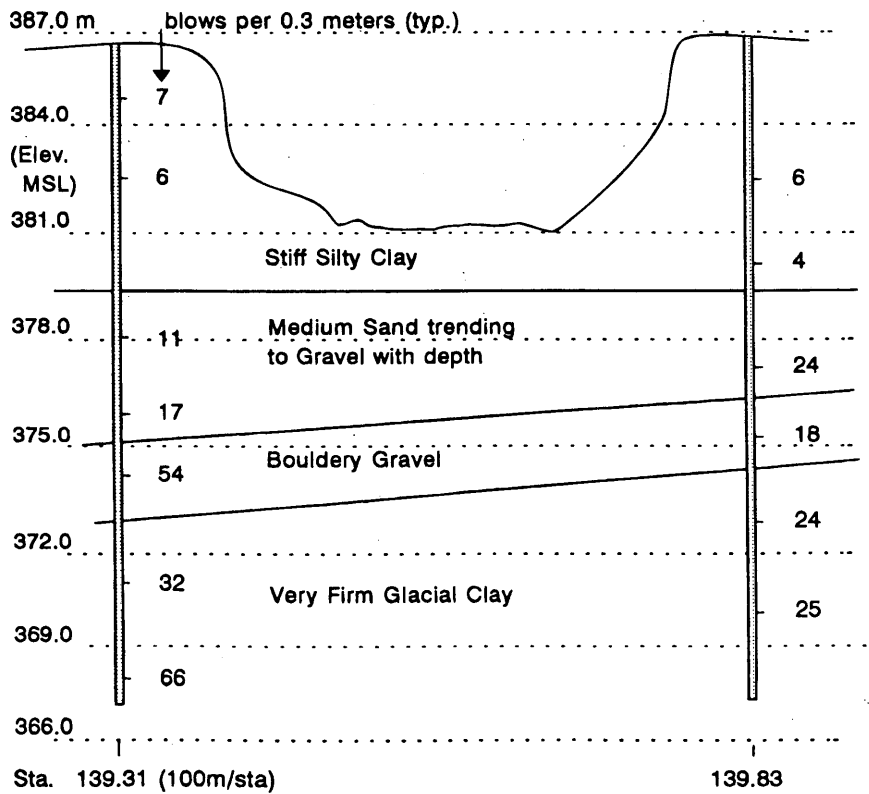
Soil borings for US-71 Bridge (Iowa DOT, 8/1993).
